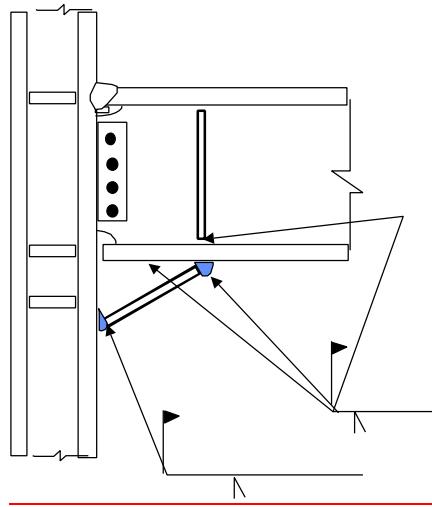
Bottom Haunch Connection Modification
